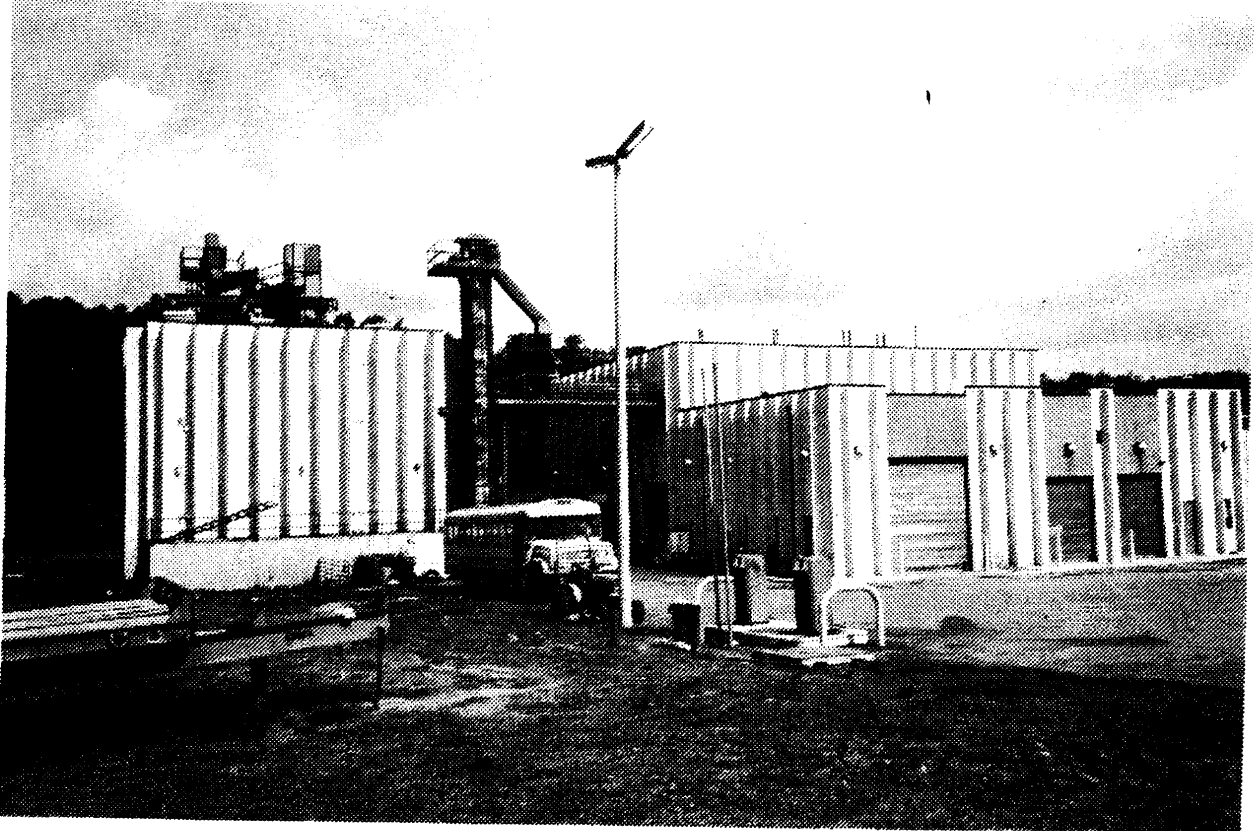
The Augusta Correctional Center heating plant. The building on the left is for fuel storage. The building on the right houses three wood-waste boilers and attendant equipment.
